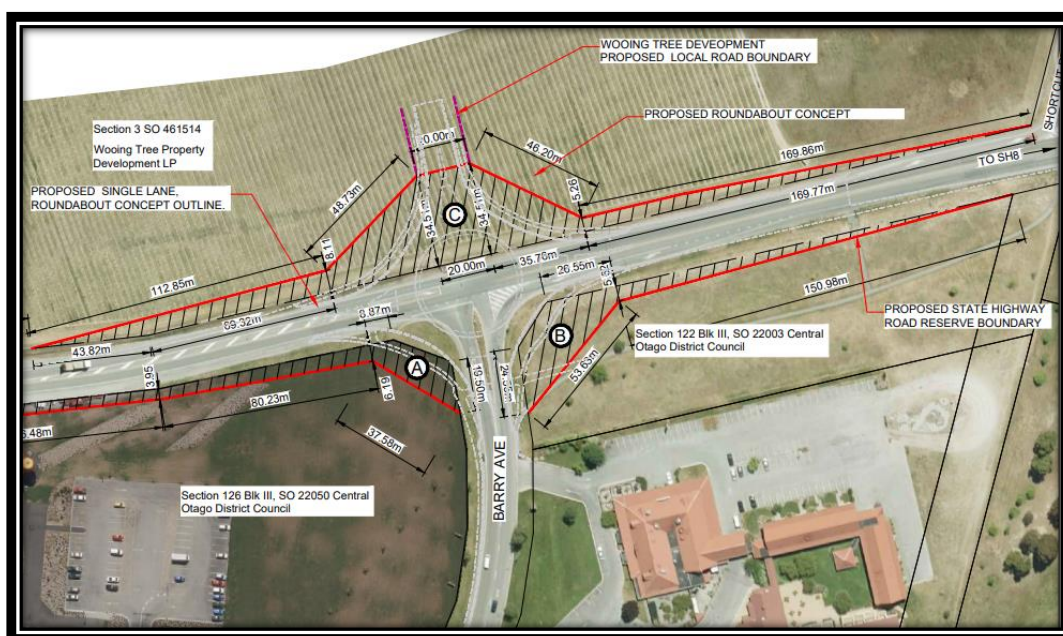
Preliminary Plan: Wooing Tree Roundabout
